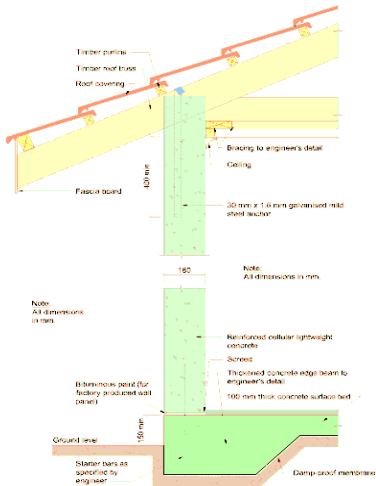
Vertical section through external wall showing foundation and roof anchorage details
